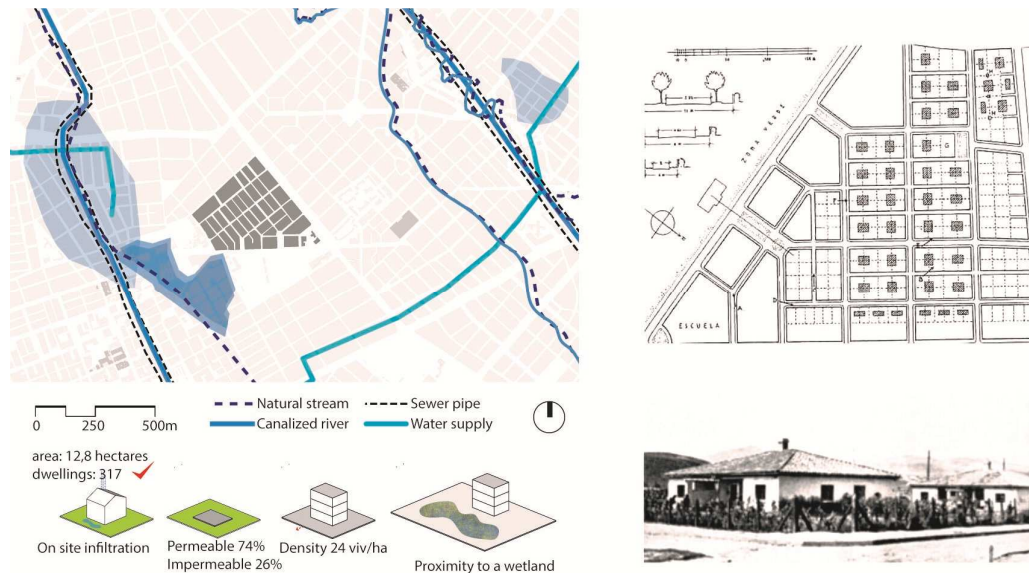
Plan Barrio Centenario, Karl Brunner, 1938
